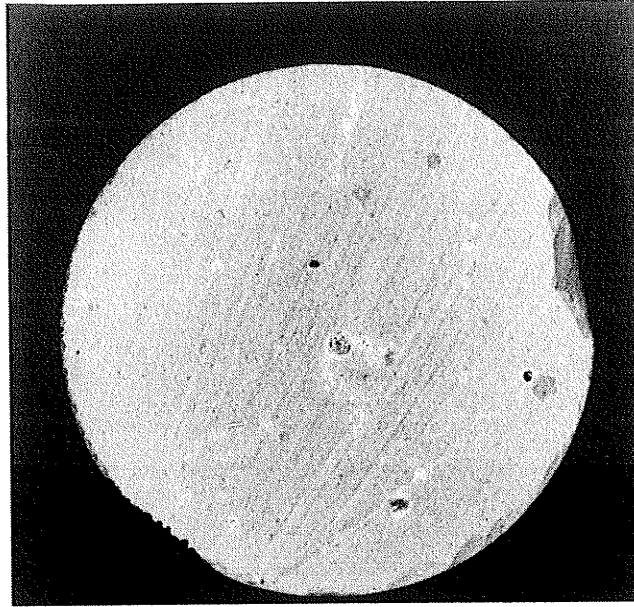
Cross-section of uncracked specimen at end of test (Mix A specimens)
